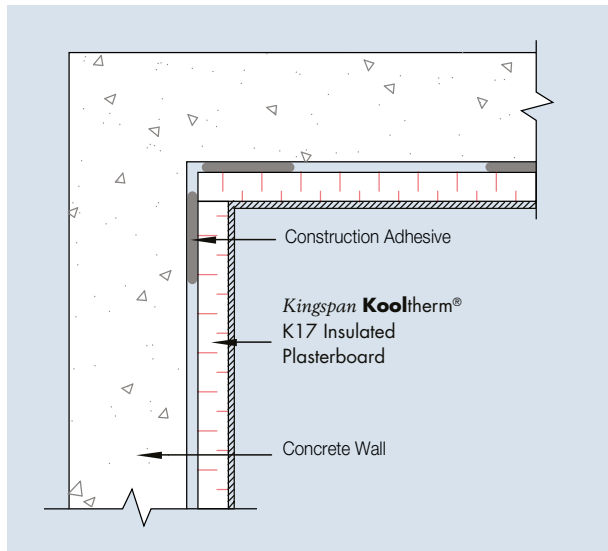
Internal corner detail with Kingspan Kooltherm® K17 Insulated Plasterboard
